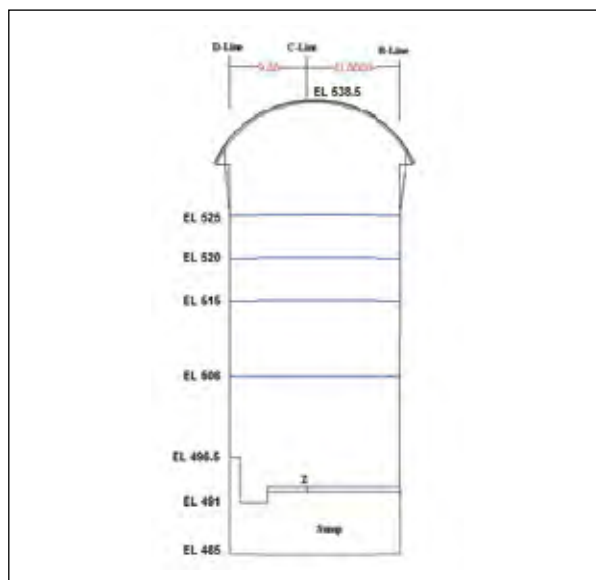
Section of the Machine Hall Cavern, showing general geometry (dimensions and elevations are in meter) and the locations where convergences were measured (Naik et al., 2011b).
